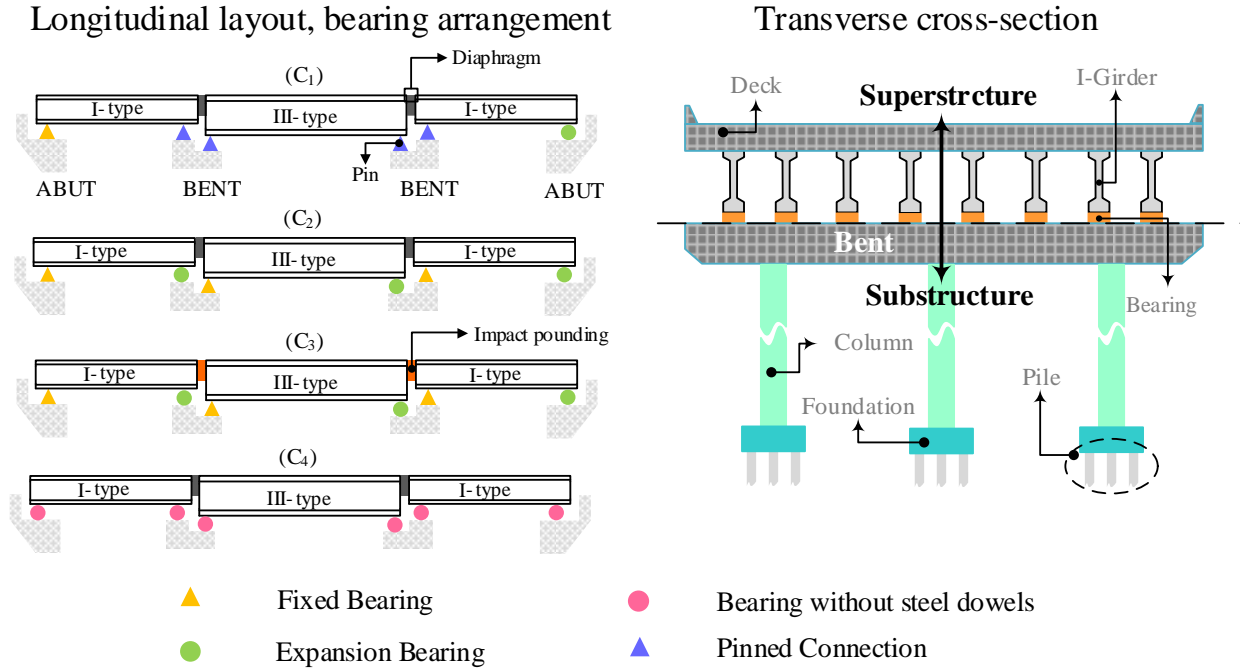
Schematic view of a typical multi-span RC I-girder bridge with bearing distribution across structural systems
